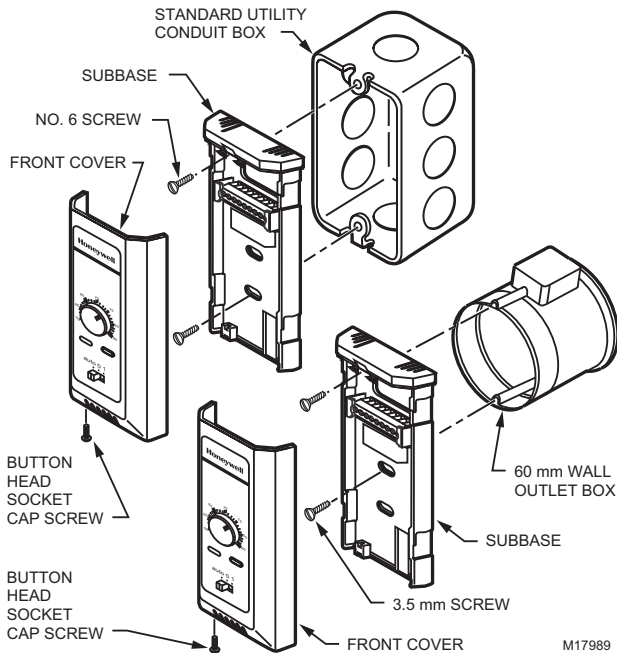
Mounting wall modules on standard utility conduit box or 60 mm wall outlet box.
